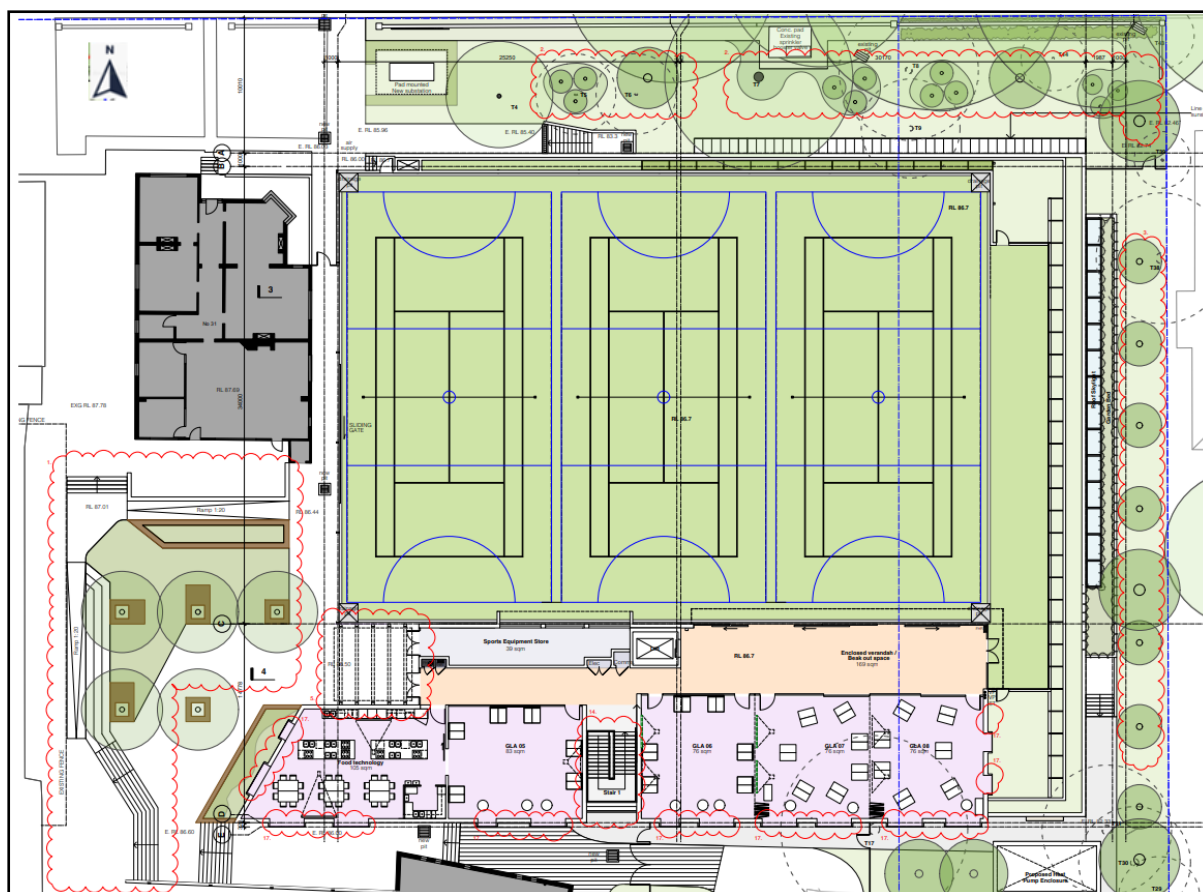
| Proposed level 3 modifications (Source: Applicant's Modification Report 2022)
